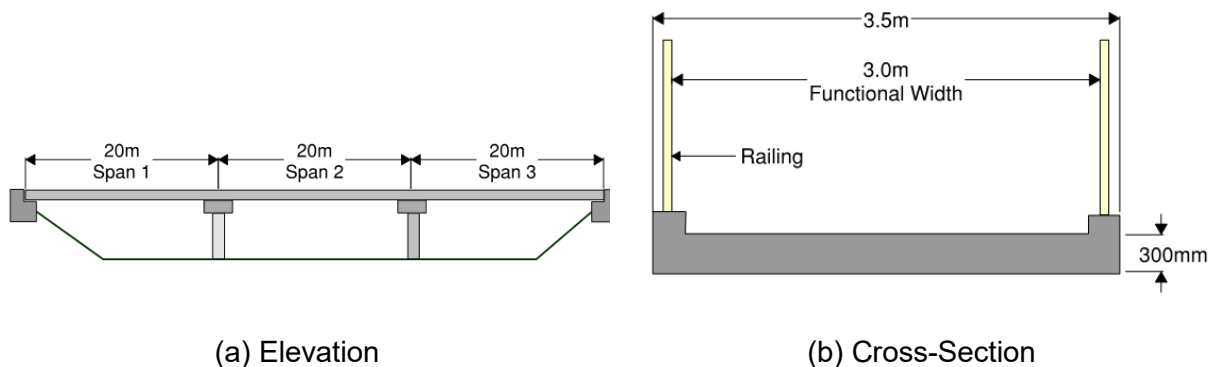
Elevation and cross-section of prestressed concrete footbridge
